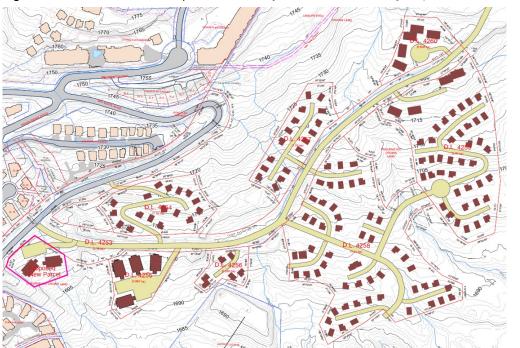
Black Forest Plan (Source: Brent Harley and Associates- Secondary Plan)
